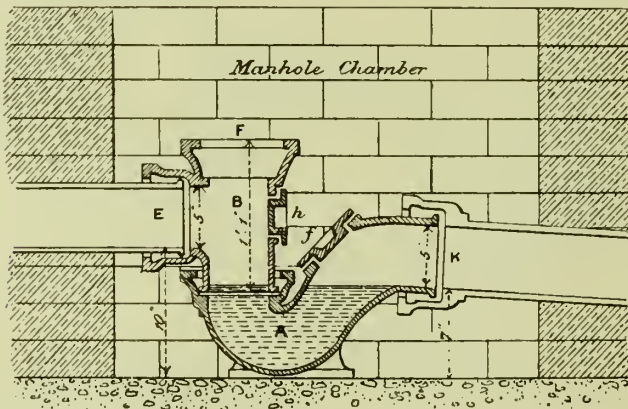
Five-inch Cast-iron Trap, with turn-round Inlet, and Head for Pipe-shaft.
